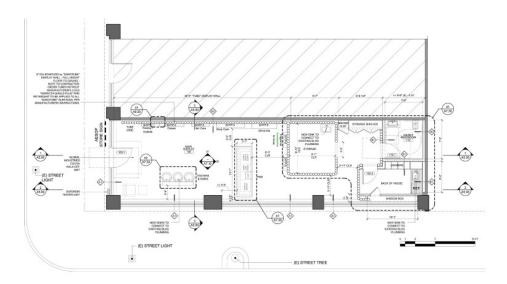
Aesop skincare store floor plan 2 (Aesop, 2016).
